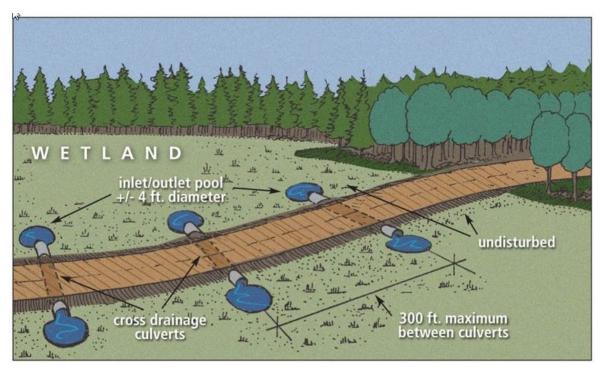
Proper Cross Drainage Culvert Installation & Placement on a Wetland Road.
